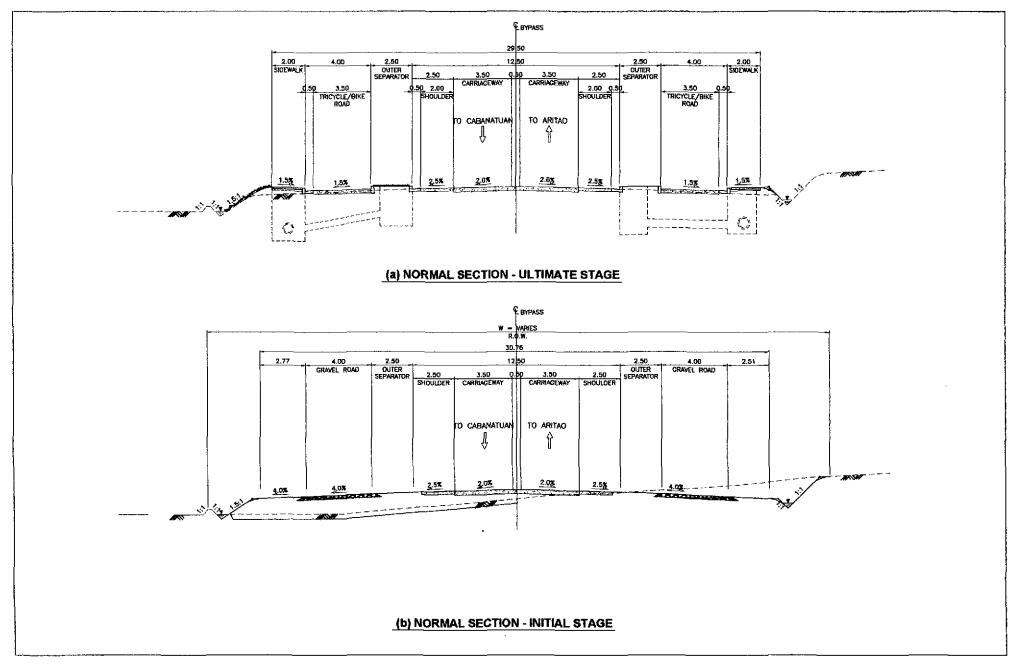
TYPICAL CROSS SECTIONS (SAN JOSE)
